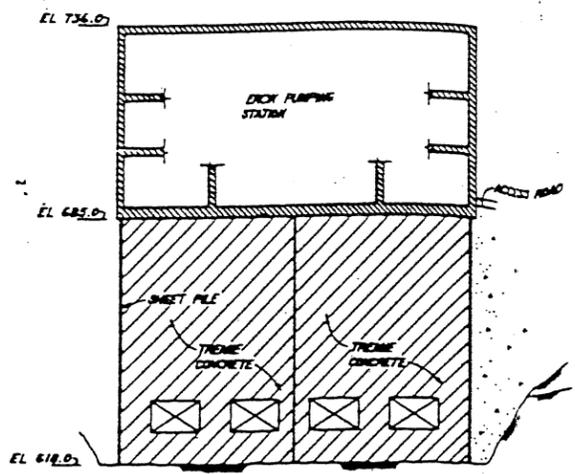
Excavation & Backfill Category I Structures
